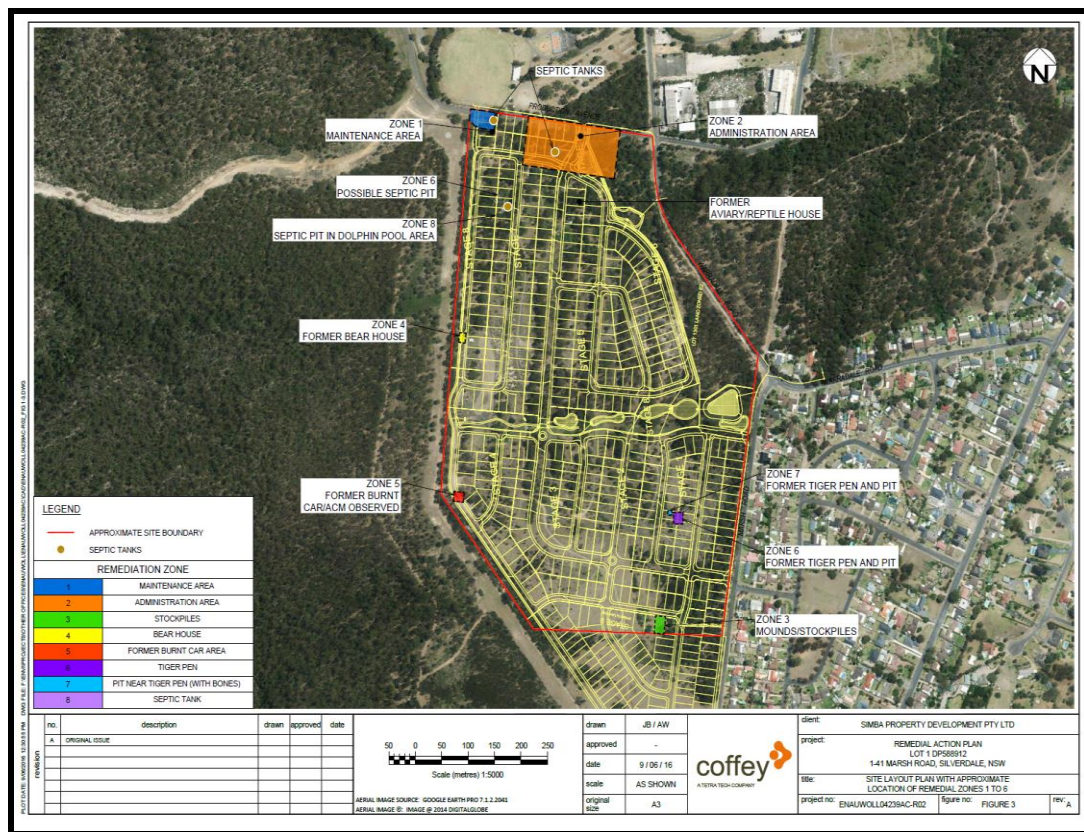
Site layout plan with approximate location of remedial zones 1 to 6
